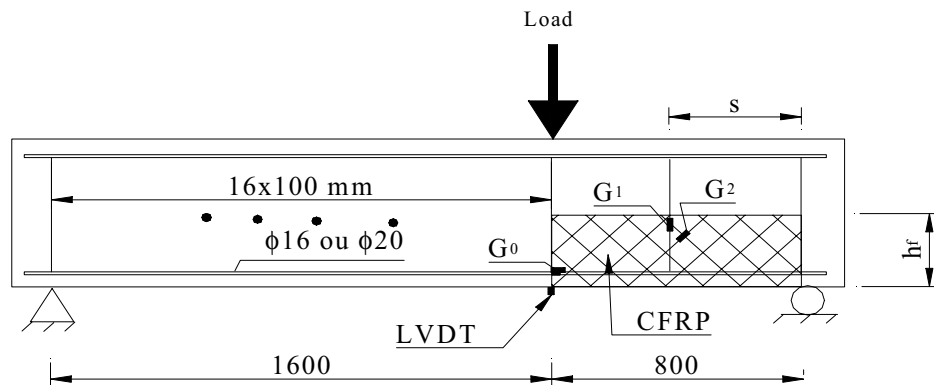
Test reinforced concrete beam geometry (dimension in mm)
